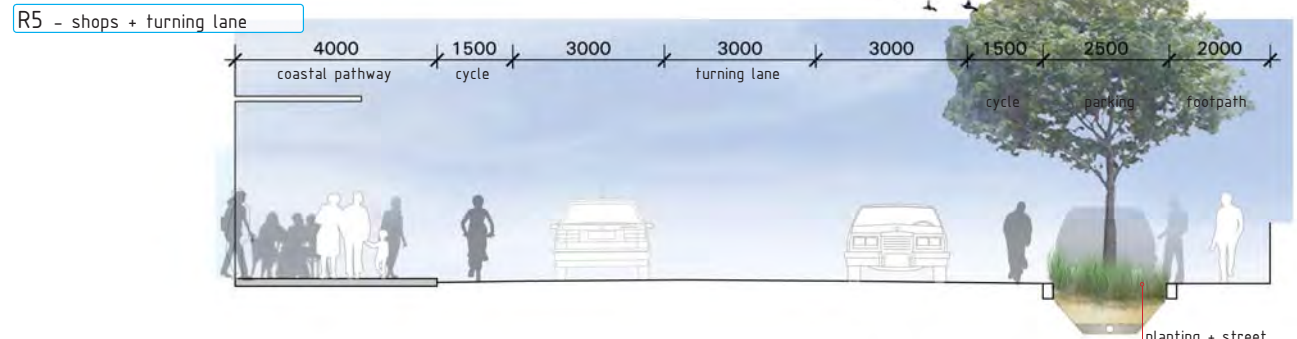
Redcliffs: Beachville Road / Main Road coastal boardwalk section.
